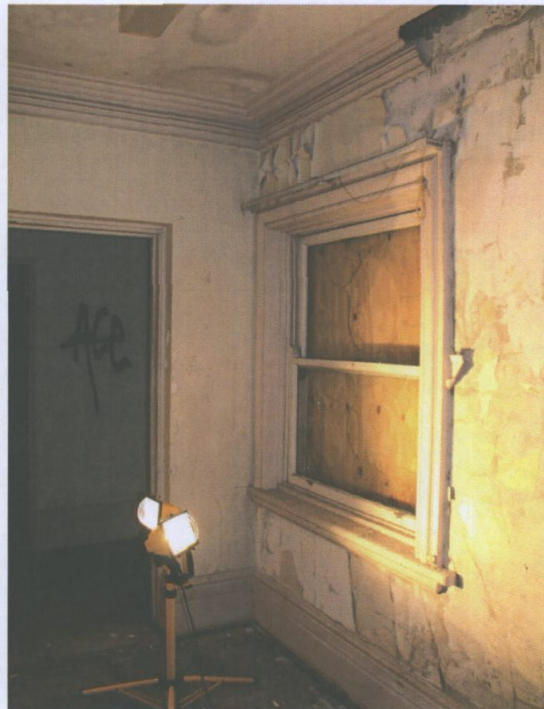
Hall 3 with severe water damage. Paul Davies 2014.
